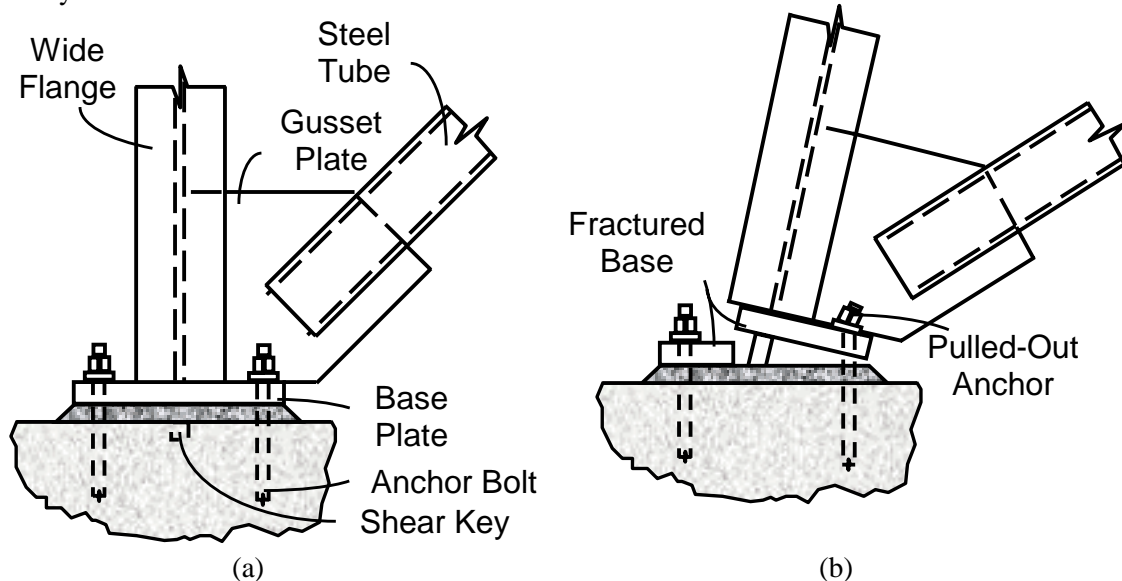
Column foundation failure: Schematic representation of column-foundation joint of the 4-storey Oviatt Library building at the California State University, Northridge, (a) before, and (b) after the 1994 Northridge earthquake, showing anchor bolt pull-out due to fracturing of base plate (Krawinkler, et al., 1996). Base-plate fracture and consequent base plate rotation resulted in significant drifts in upper storeys of the building.
